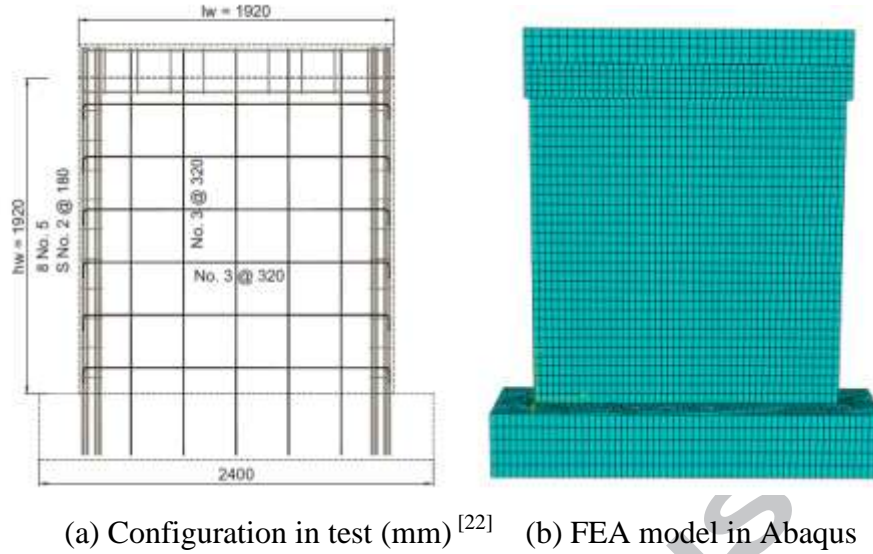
Reinforcement layout and FEA model of the concrete specimen
